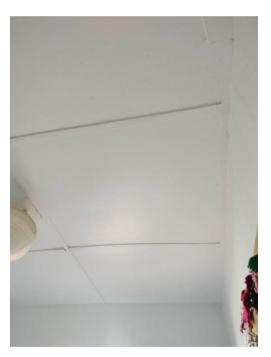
Plaster panelling in ceiling of 77 Crown Street. Source: Curio 2023
